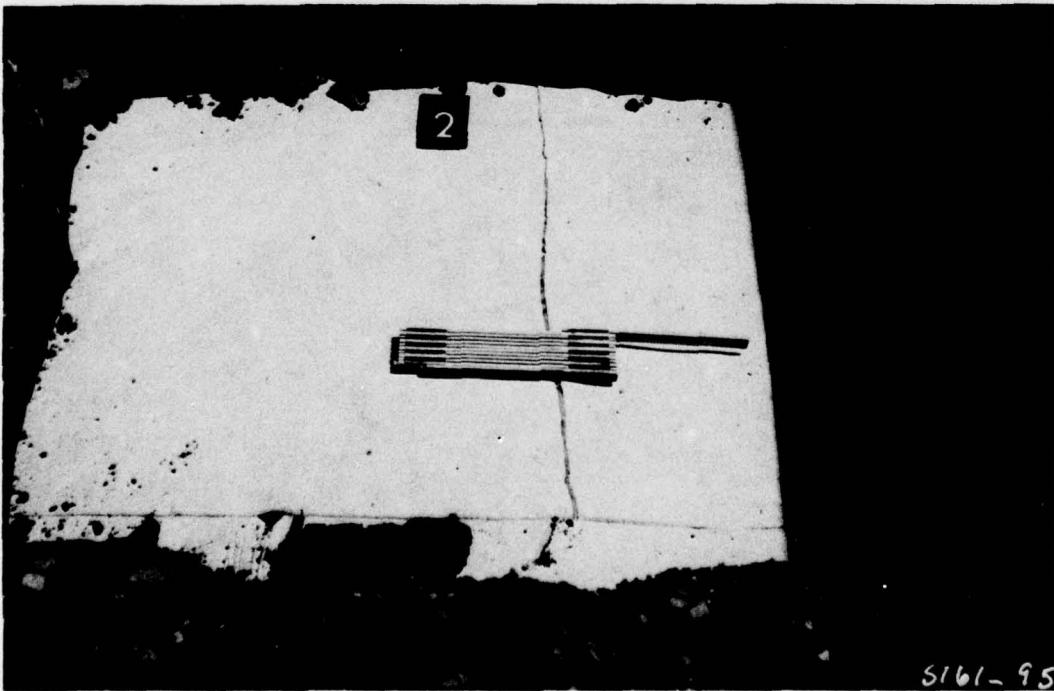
Break in Styrofoam in Test Section No. 4, item 2, after reduced thickness and all traffic
